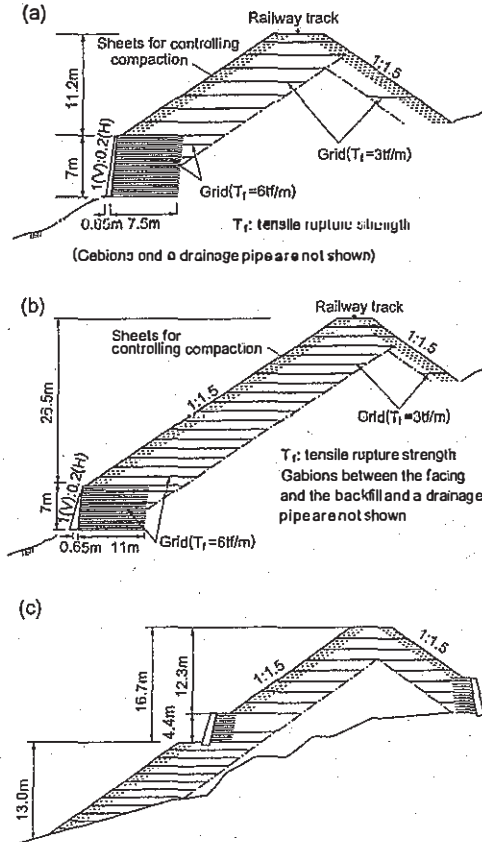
Three typical cross-sections of reconstructed embankment; (a) the site IV, (b) the site II and (c) the site I, Aso site
